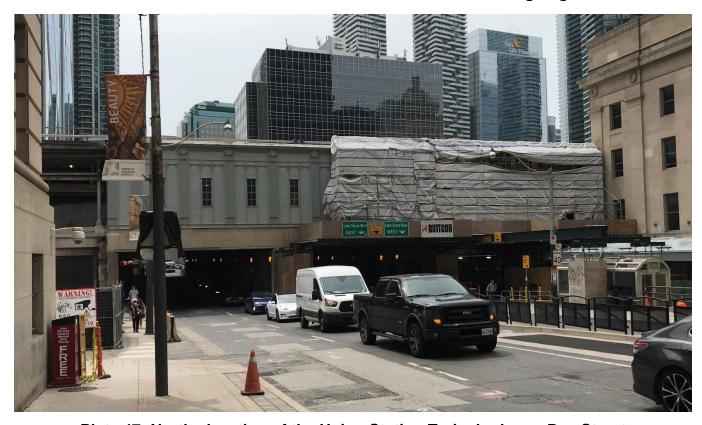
North elevation of the Union Station Trainshed over Bay Street
